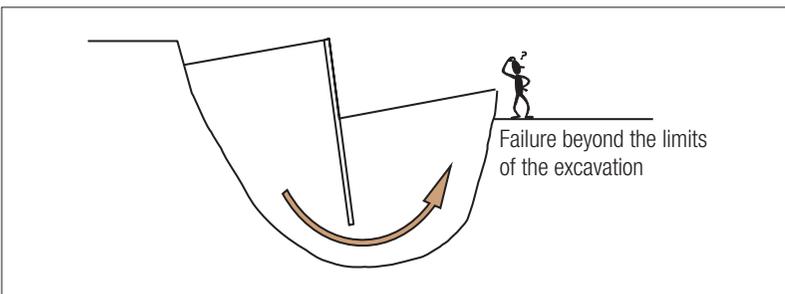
Overall instability, rotational failure induced by a retained excavation – strength controlled ULS (GEO)
